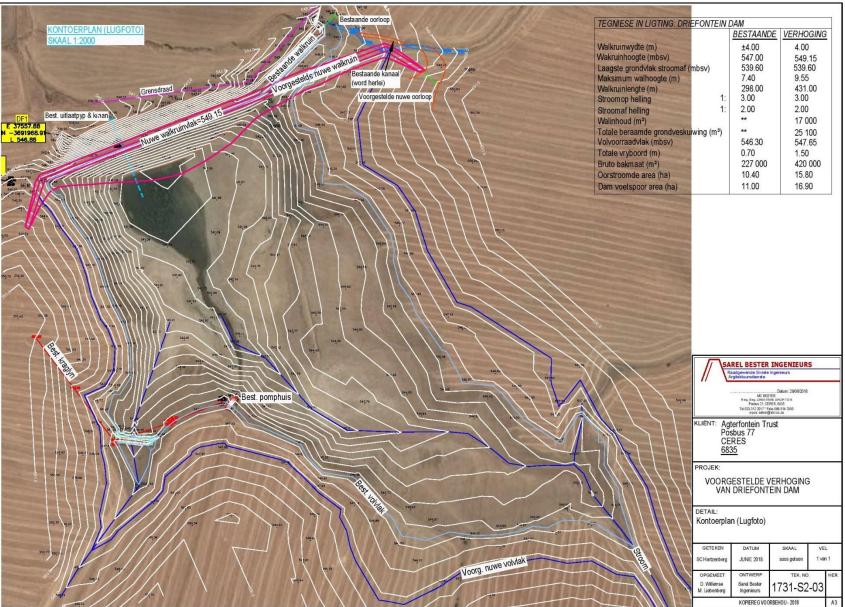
The proposed layout of the dam wall and spillway to be constructed during Phase 1 of the proposed development (Sarel Bester Ingenieurs, 2018).
